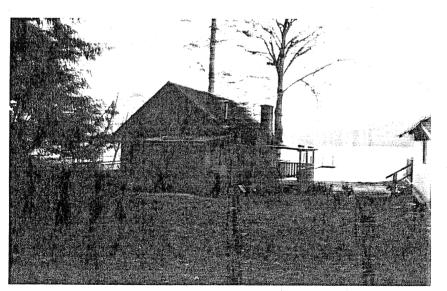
View from the rear of the cottage planned for rebuild. The top of the cement foundation is within the 200 year flood elevation (167 metres).
